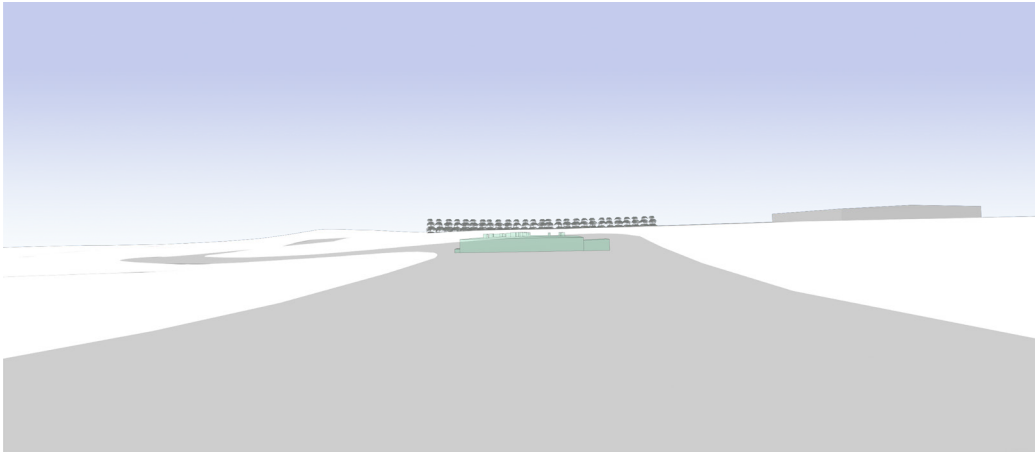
View 02 - Buildings with proposed plant and proposed boundary trees
